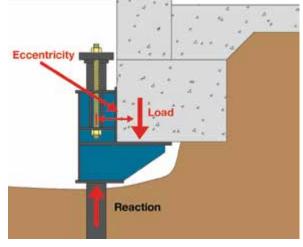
a Eccentric loading condition for under-footing bracket
